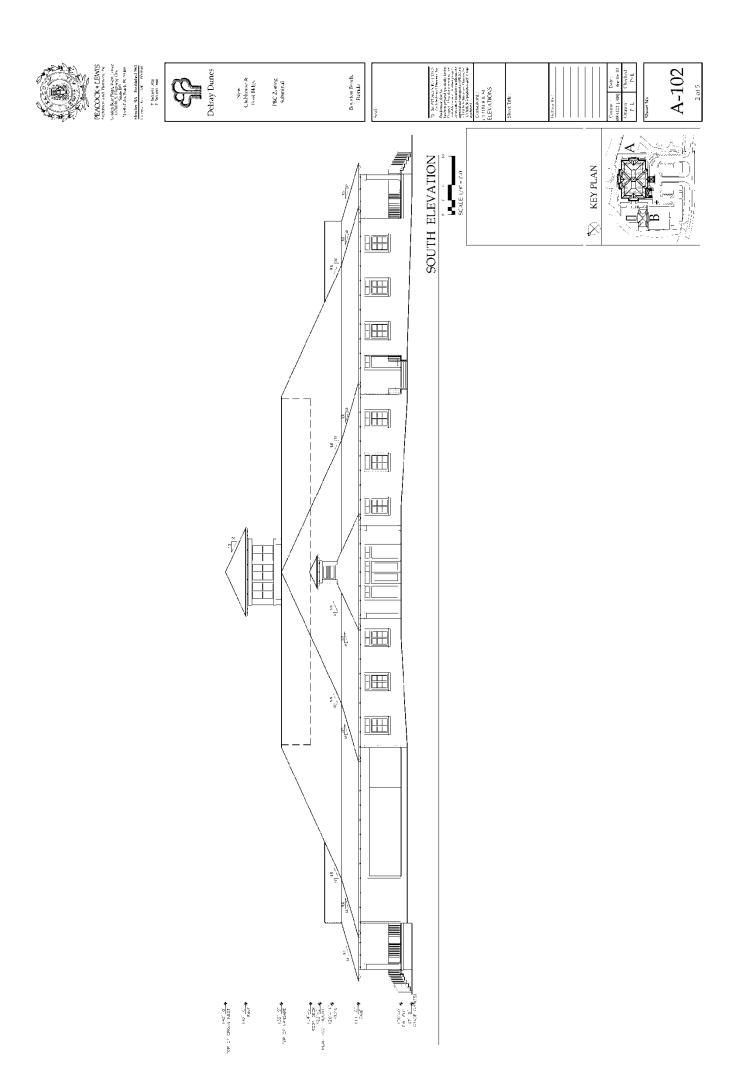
, Proposed Clubhouse Building, South (entrance) Elevation dated June 16, 2010
